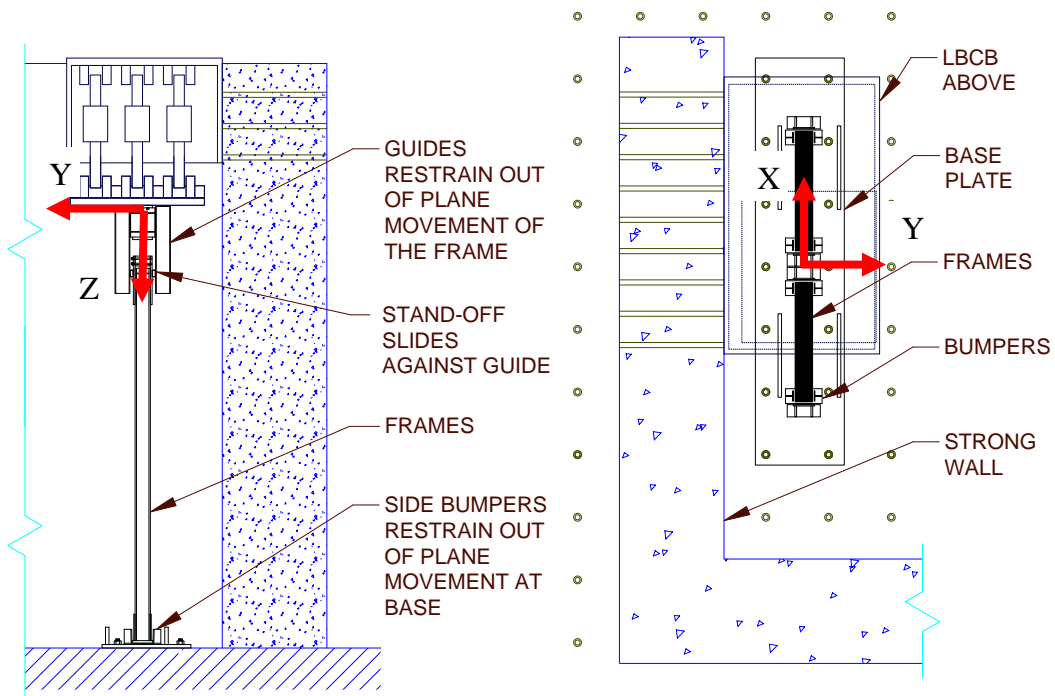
Side View (left) and Plan View (right) of the Test Setup
